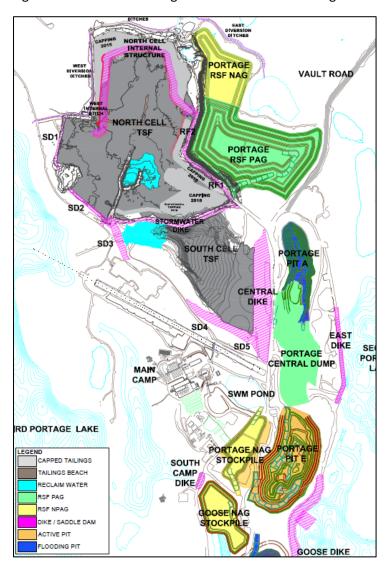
Portage Pit and Tailings Storage Facility Infrastructures
